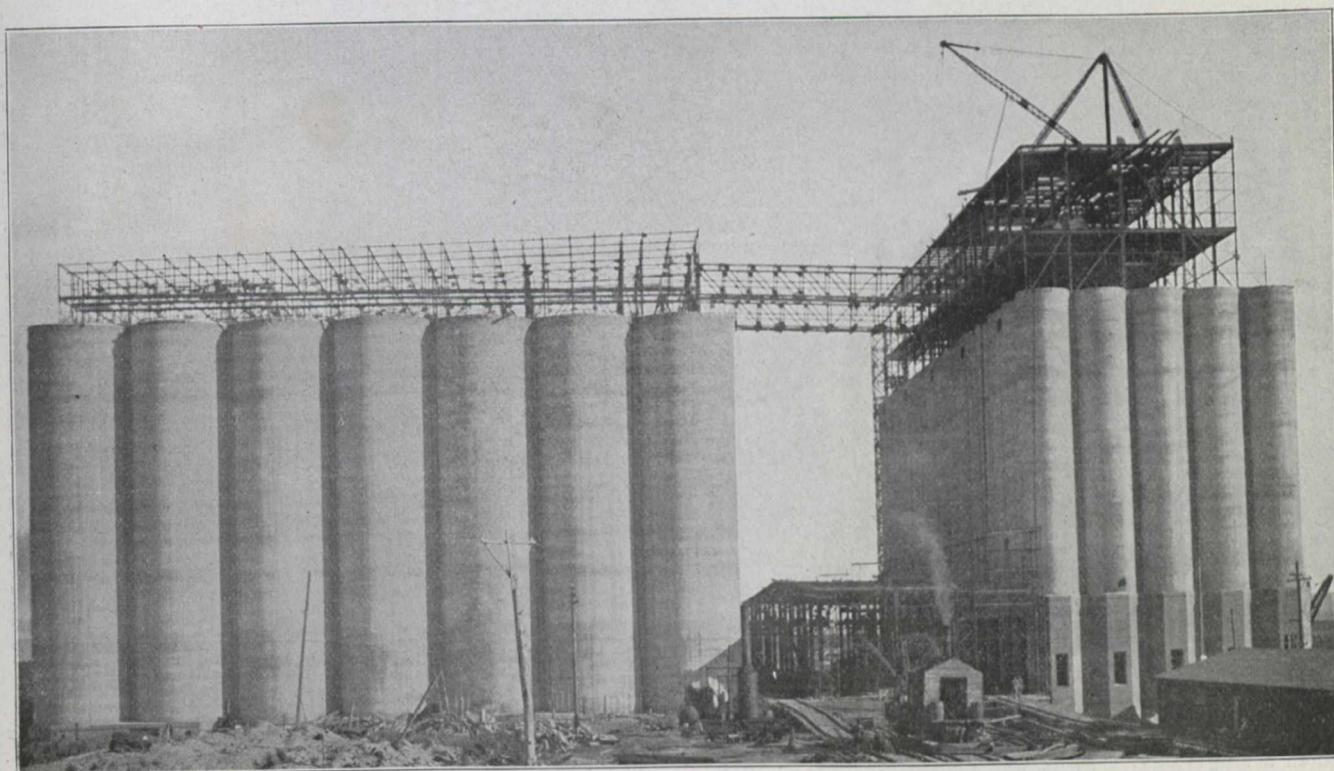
Completed Bins and Steel Frames of Track Shed and Cupolas, Grand Trunk Pacific Elevators, Fort William, Ont.
